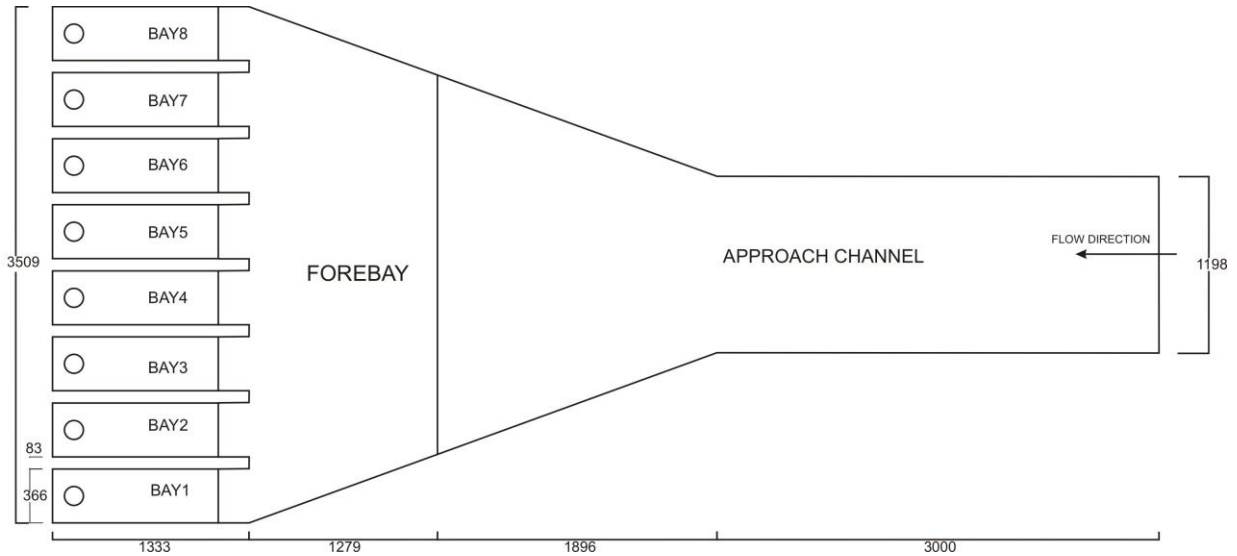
Plan view of the pump intakes-CFD model (all dimensions in mm)
